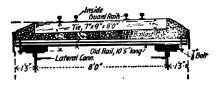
Bridge Floor of Old Rails; C. & O. Ry.
